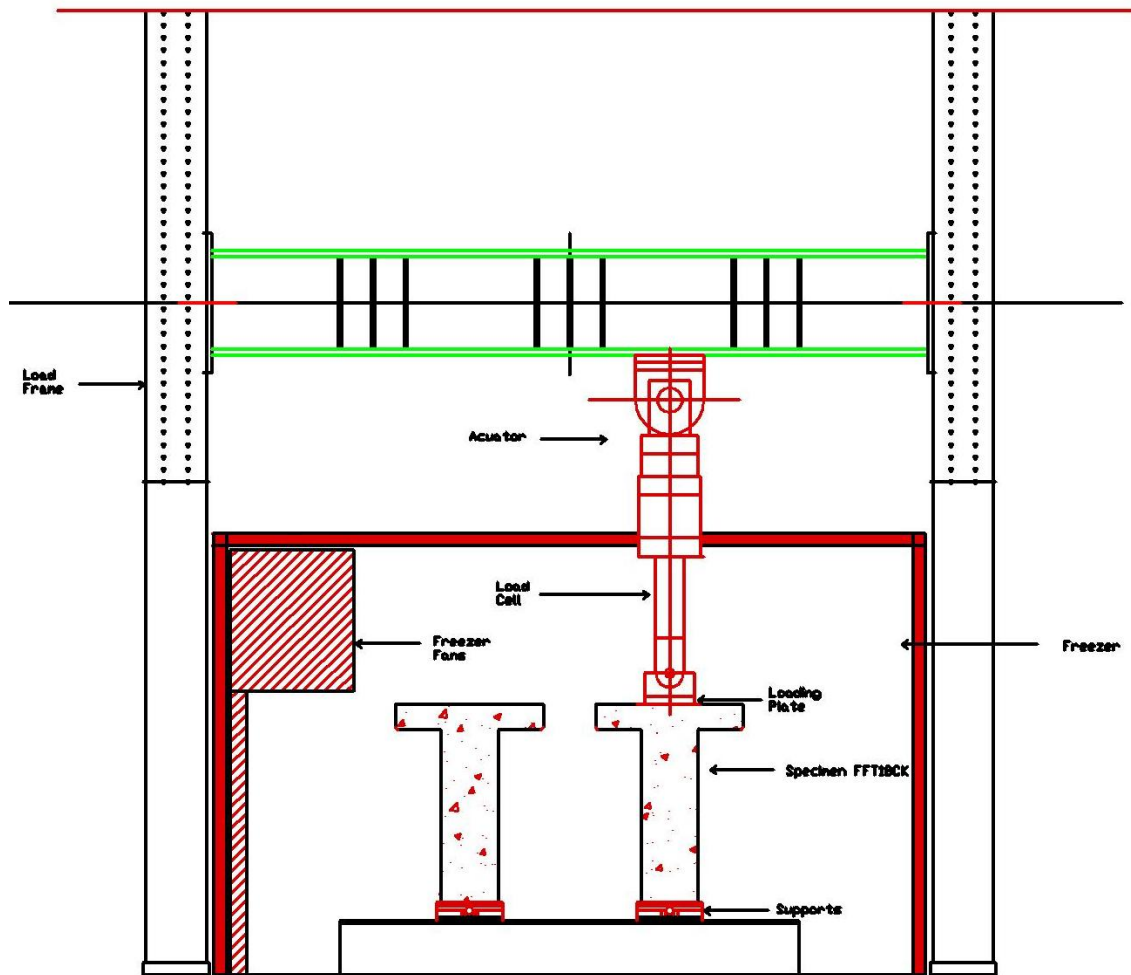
Fatigue + Freeze-Thaw Loading Setup (South View)
